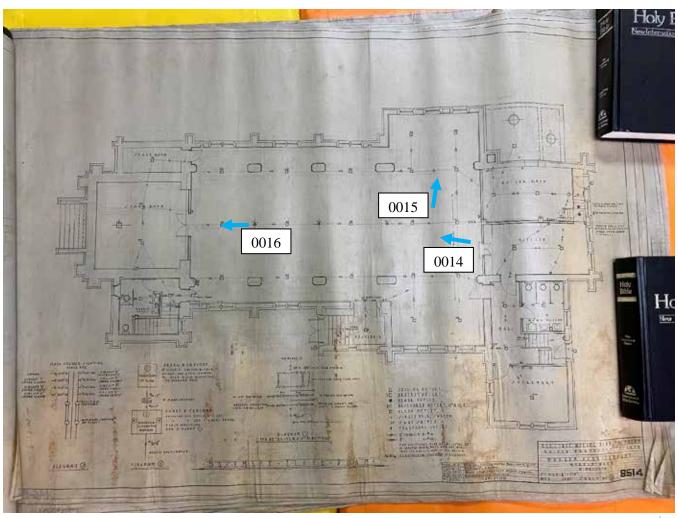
Lower-Level Photo Key. Background drawing "Electric Wiring Plan Basement United Protestant Church," German and Jenssen. Courtesy of Untied Protestant Church.
